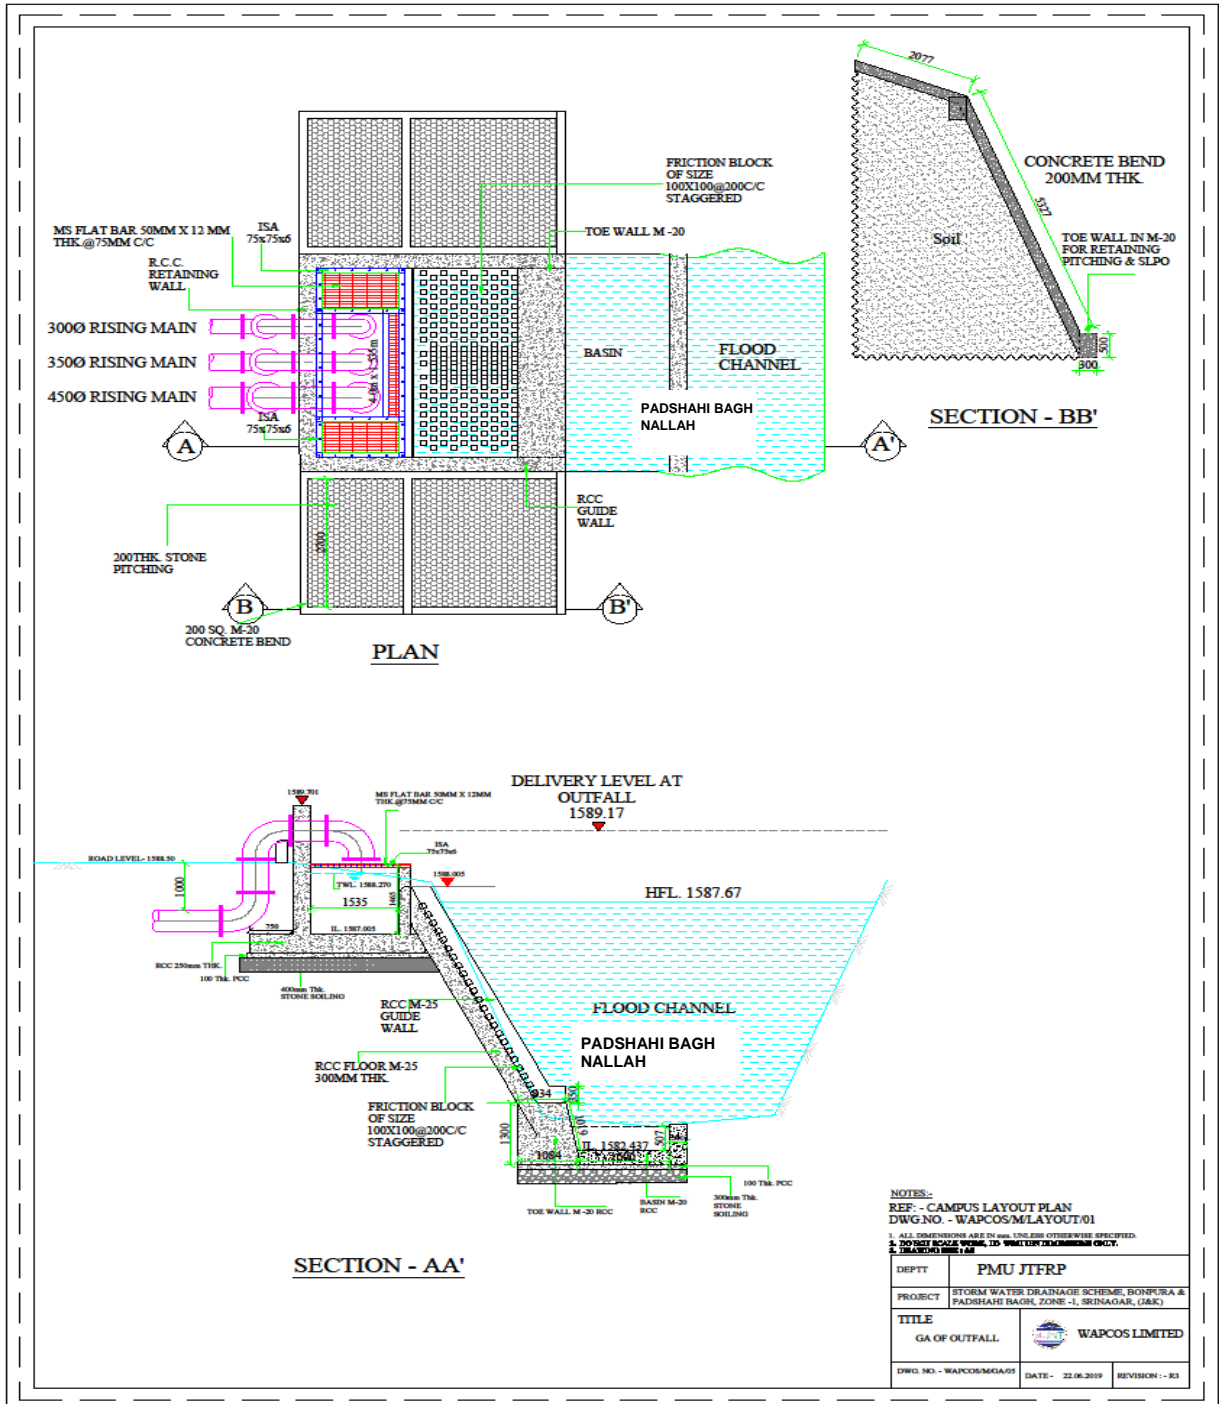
Outfall structure for Padshahi bagh Major Pumping Station (MPS)
